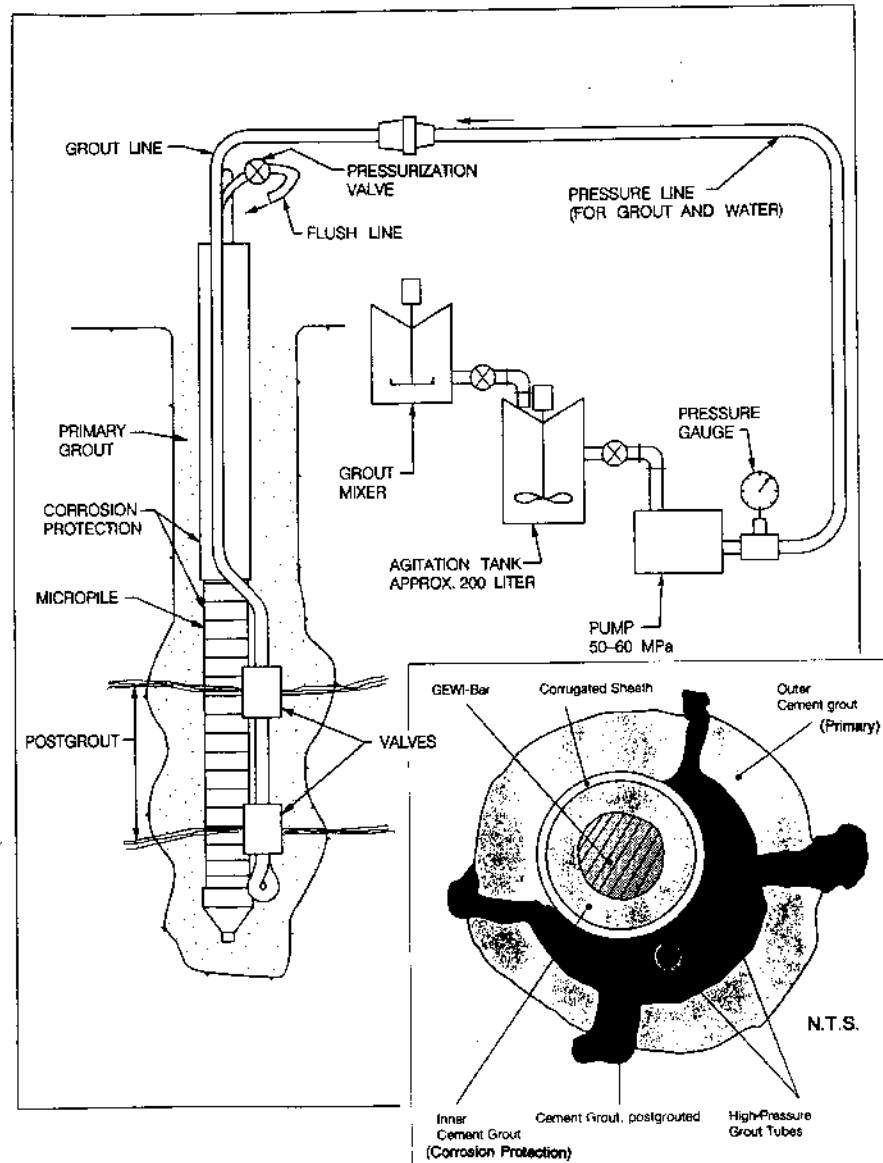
Circulating Loop Arrangement for Pressure Grouting (DSI, 1992).
